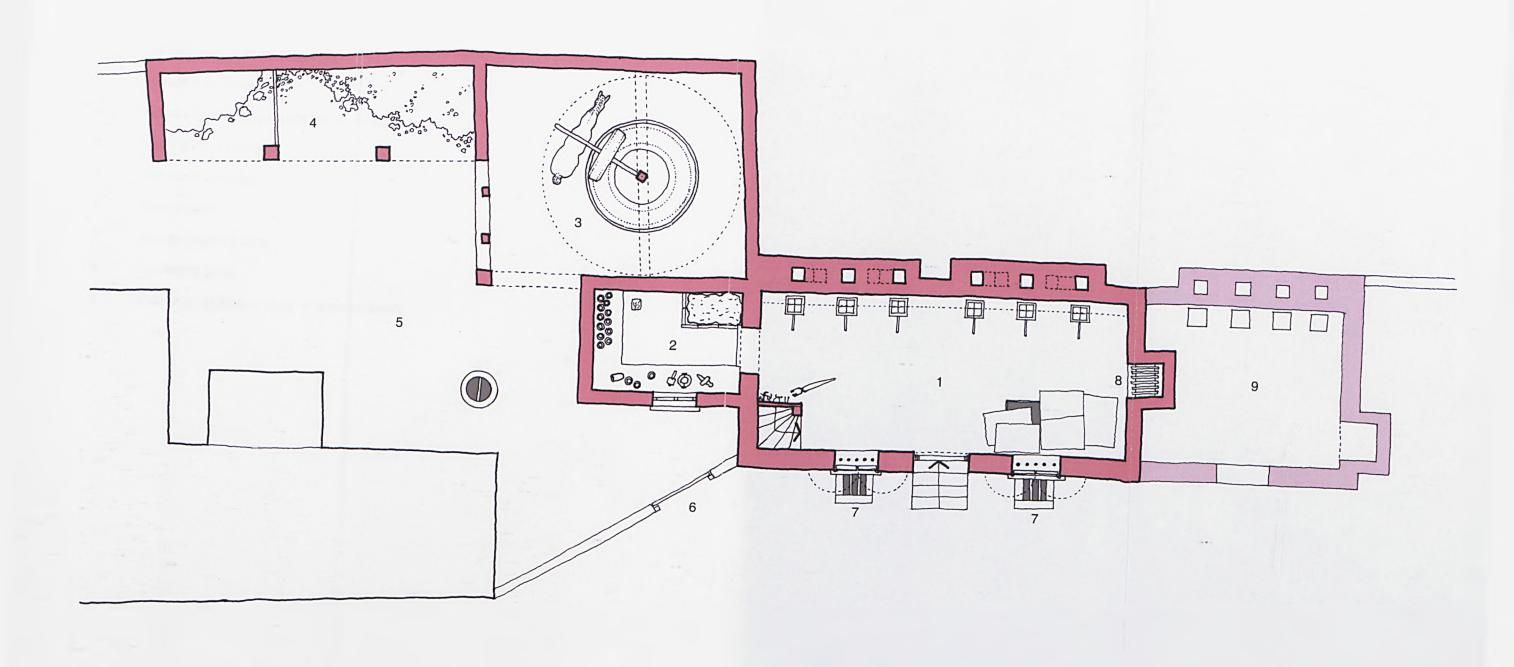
Reconstructed plan of Huntsman's original 1750 steel furnaces, situated immediately behind his cottage. Scale 1:100 (author).
